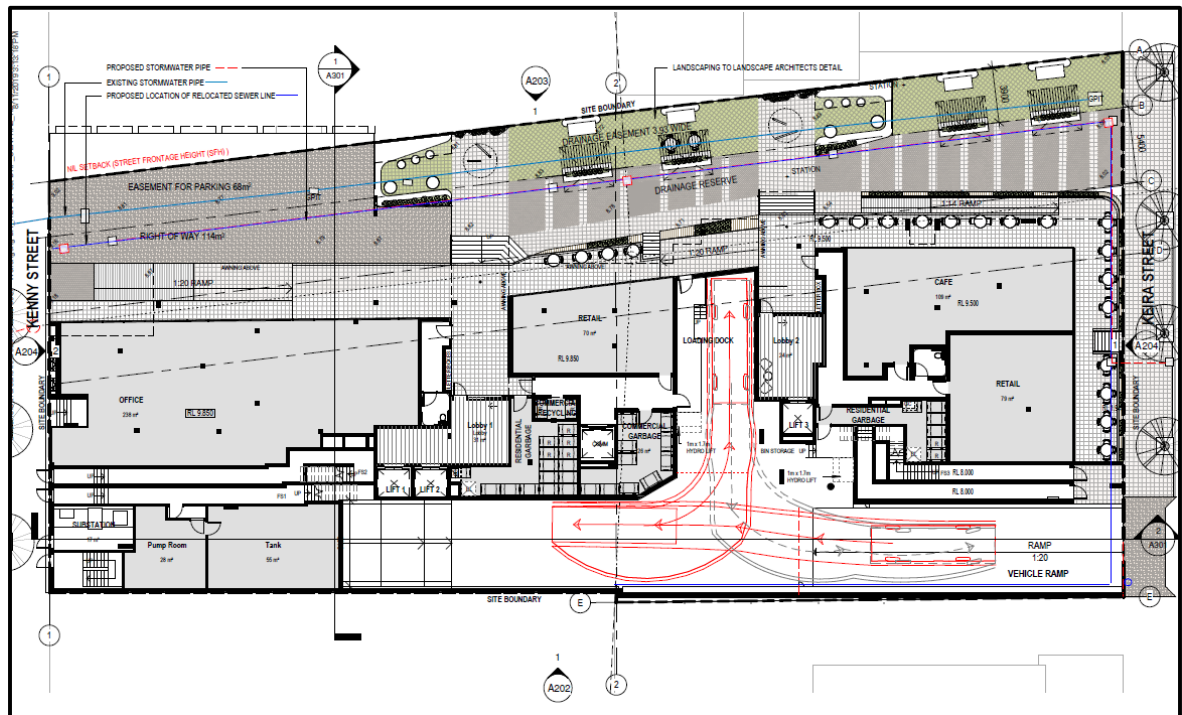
Proposed Site and Ground Floor Plan (*Source: Brewster Murray)
